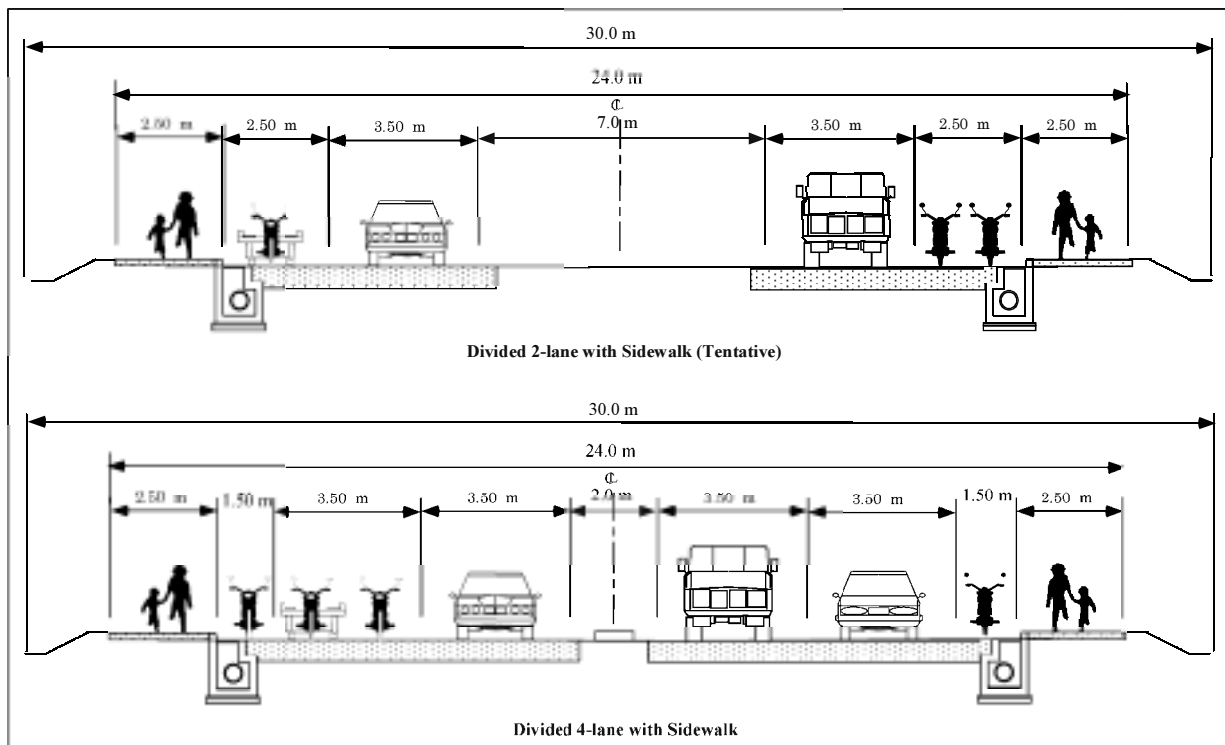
Typical Cross Section between Monivong Bridge and Km 7+000 to keep Space for Widening to 4-lane
